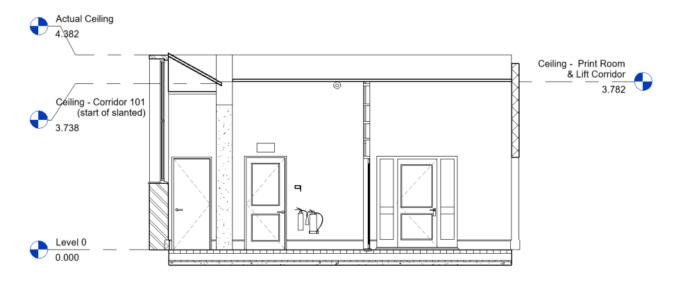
Cross section of ceilings from Corridor 101 to Stair Door to Head Department (facing it)
